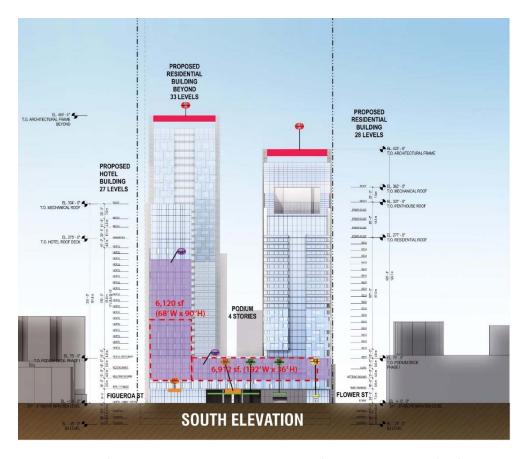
Alternative B Sign Dimensions and Locations – South Elevation
